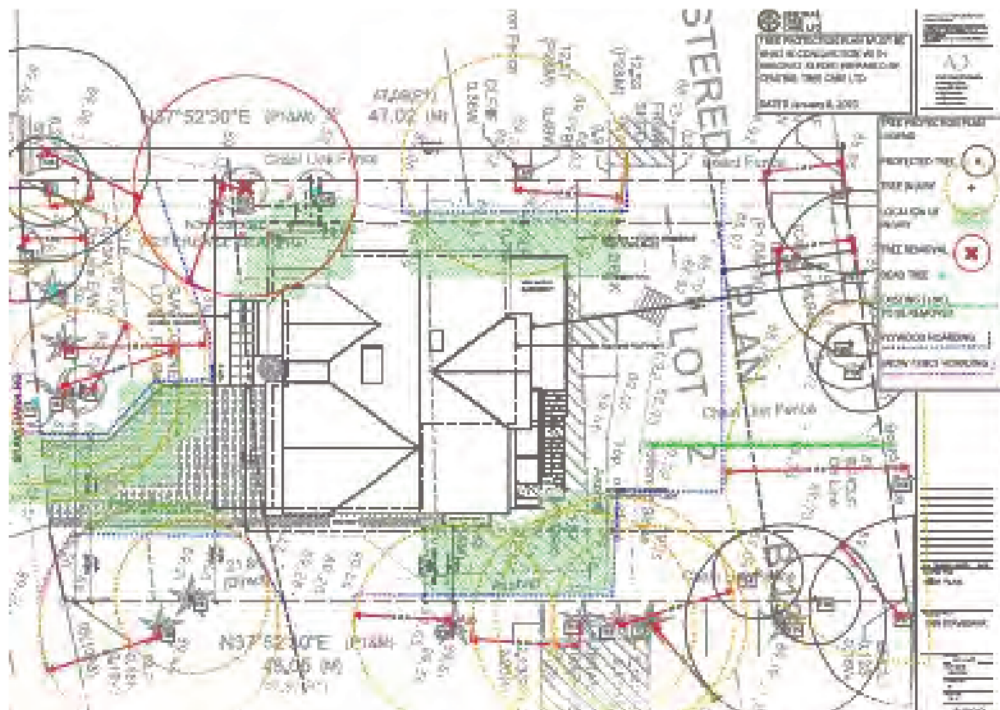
Proposed Arborist Plan (Central Tree Care Limited, Ltd., January 2019)
